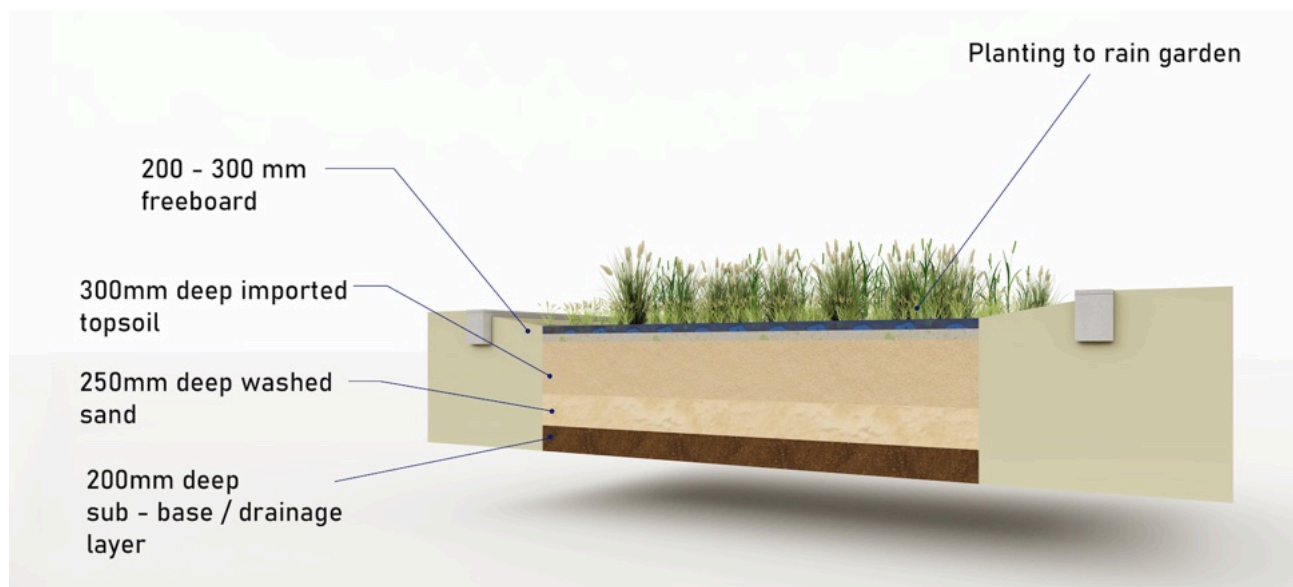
TYPICAL RAIN GARDEN DETAIL
